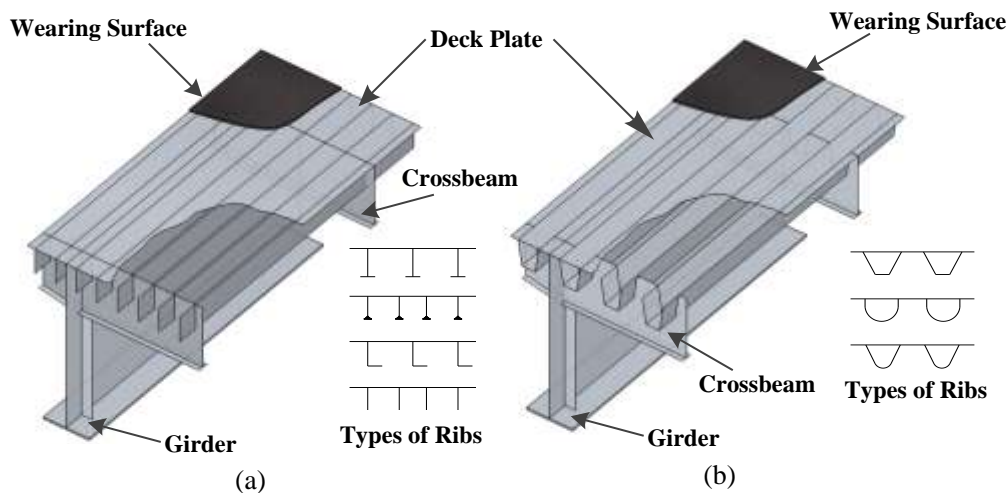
Components of the Orthotropic Steel Deck Bridge Girder System showing (a) Open Ribs and (b) Closed Ribs
